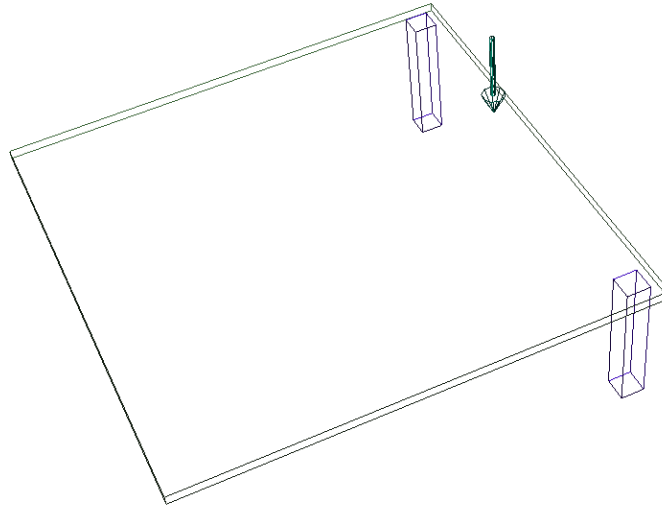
VIEW OF THE SLAB SHOWING THE POINT LOAD ON THE LINE OF COLUMNS
